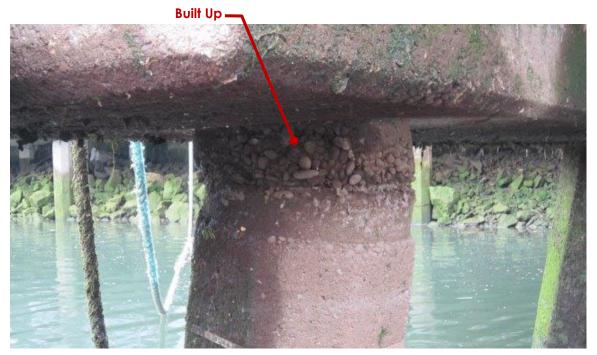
Pier 5, Bent 1 East Cap Beam
